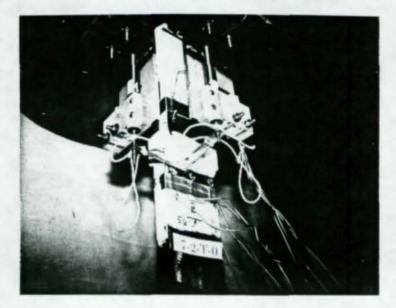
Photograph of 600 kip Baldwin Testing Machine with Data Acquisition System
